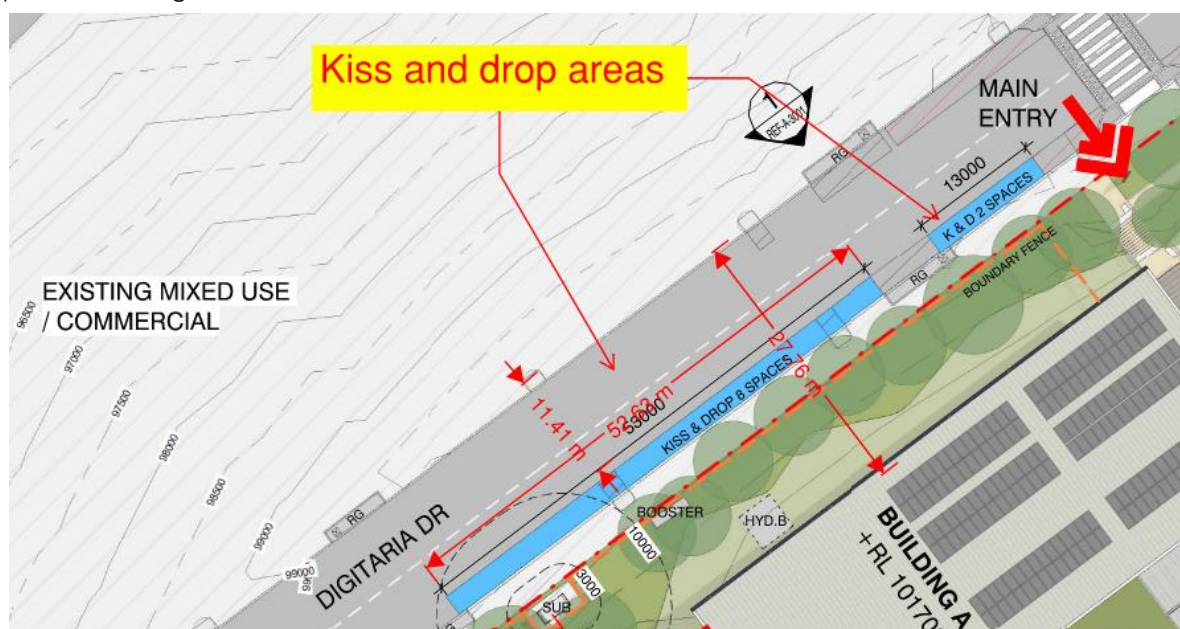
KISS AND DROP LOCATION (SCT CONSULTING TRAFFIC STUDY).
